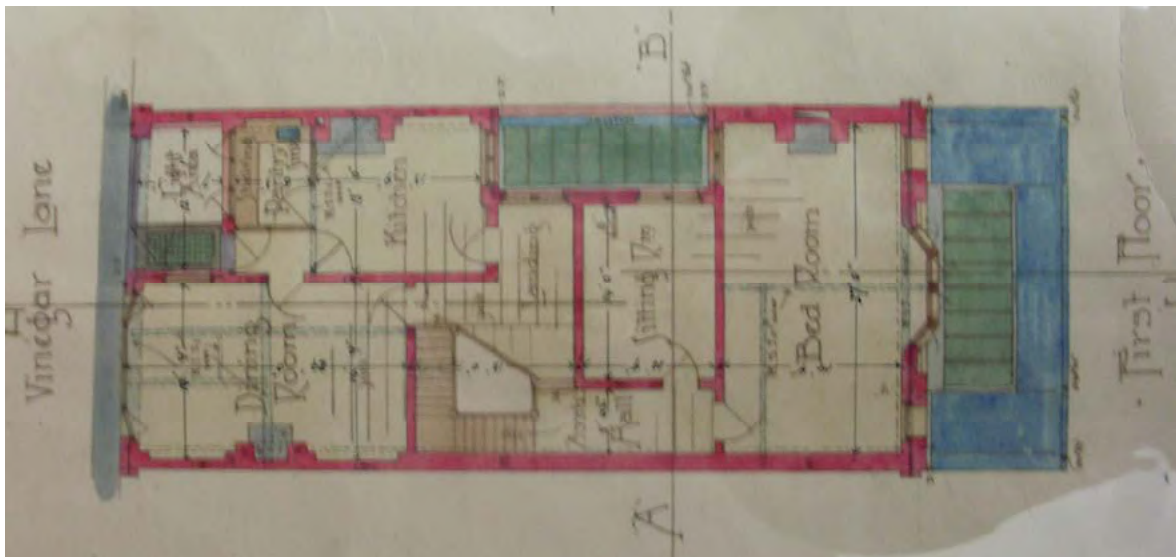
First floor plan showing kitchen, dining and sitting room areas.
